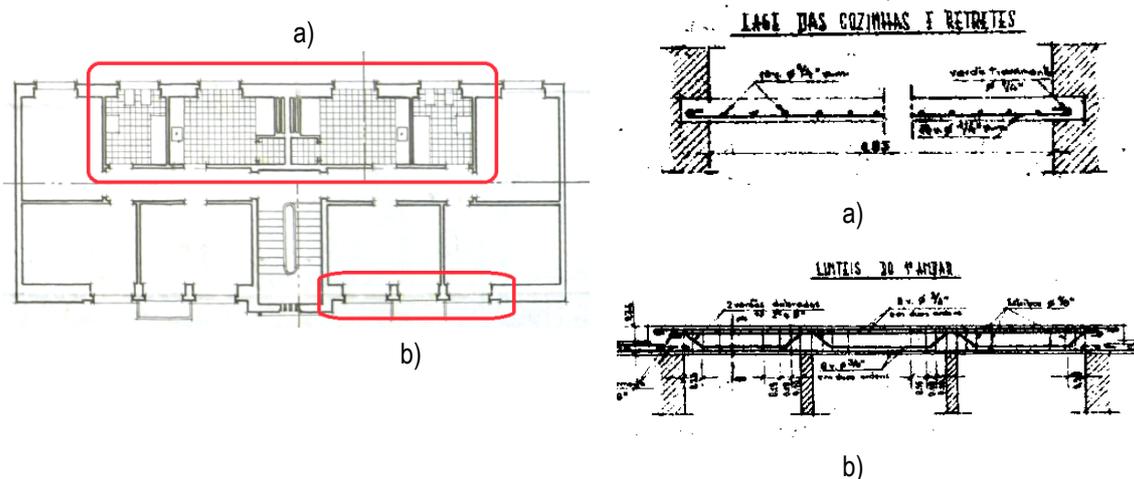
Example of a house in the Alvalade District: a) with only concrete slab in the services area b) with a brace of reinforced concrete at the floors level in the outer contour of the building (AML).
